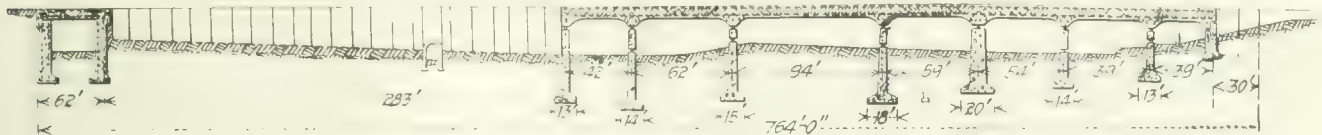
LONGITUDINAL SECTION THROUGH NOVEL FRENCH CONCRETE BRIDGE
